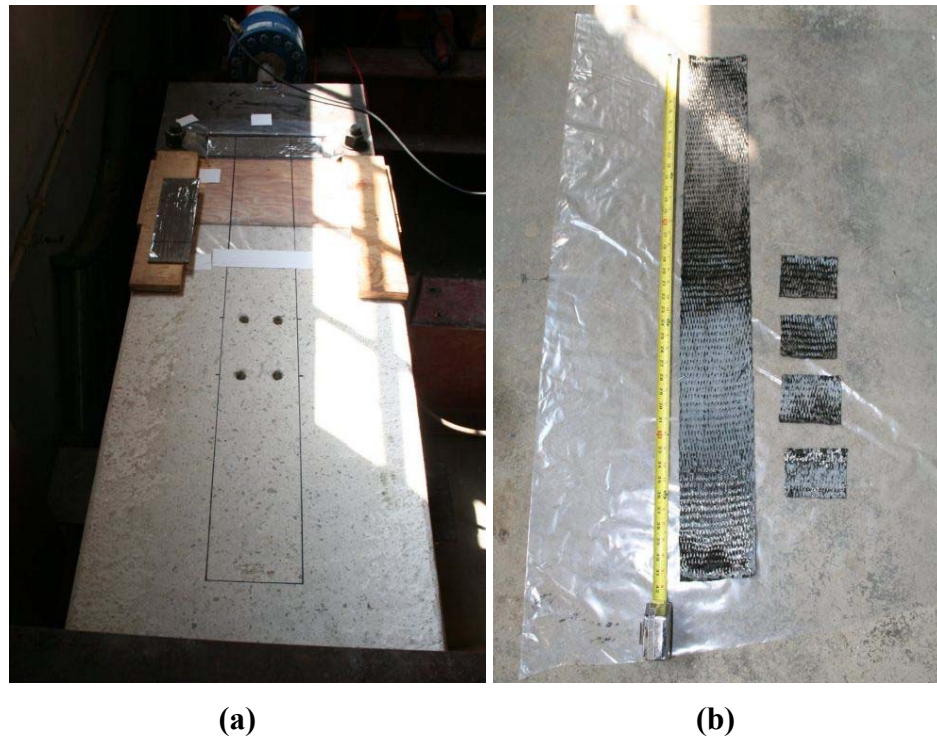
Prepared concrete surface, with anchor holes (a) and FRP pieces cut from the roll for the sheet and anchors (b)
